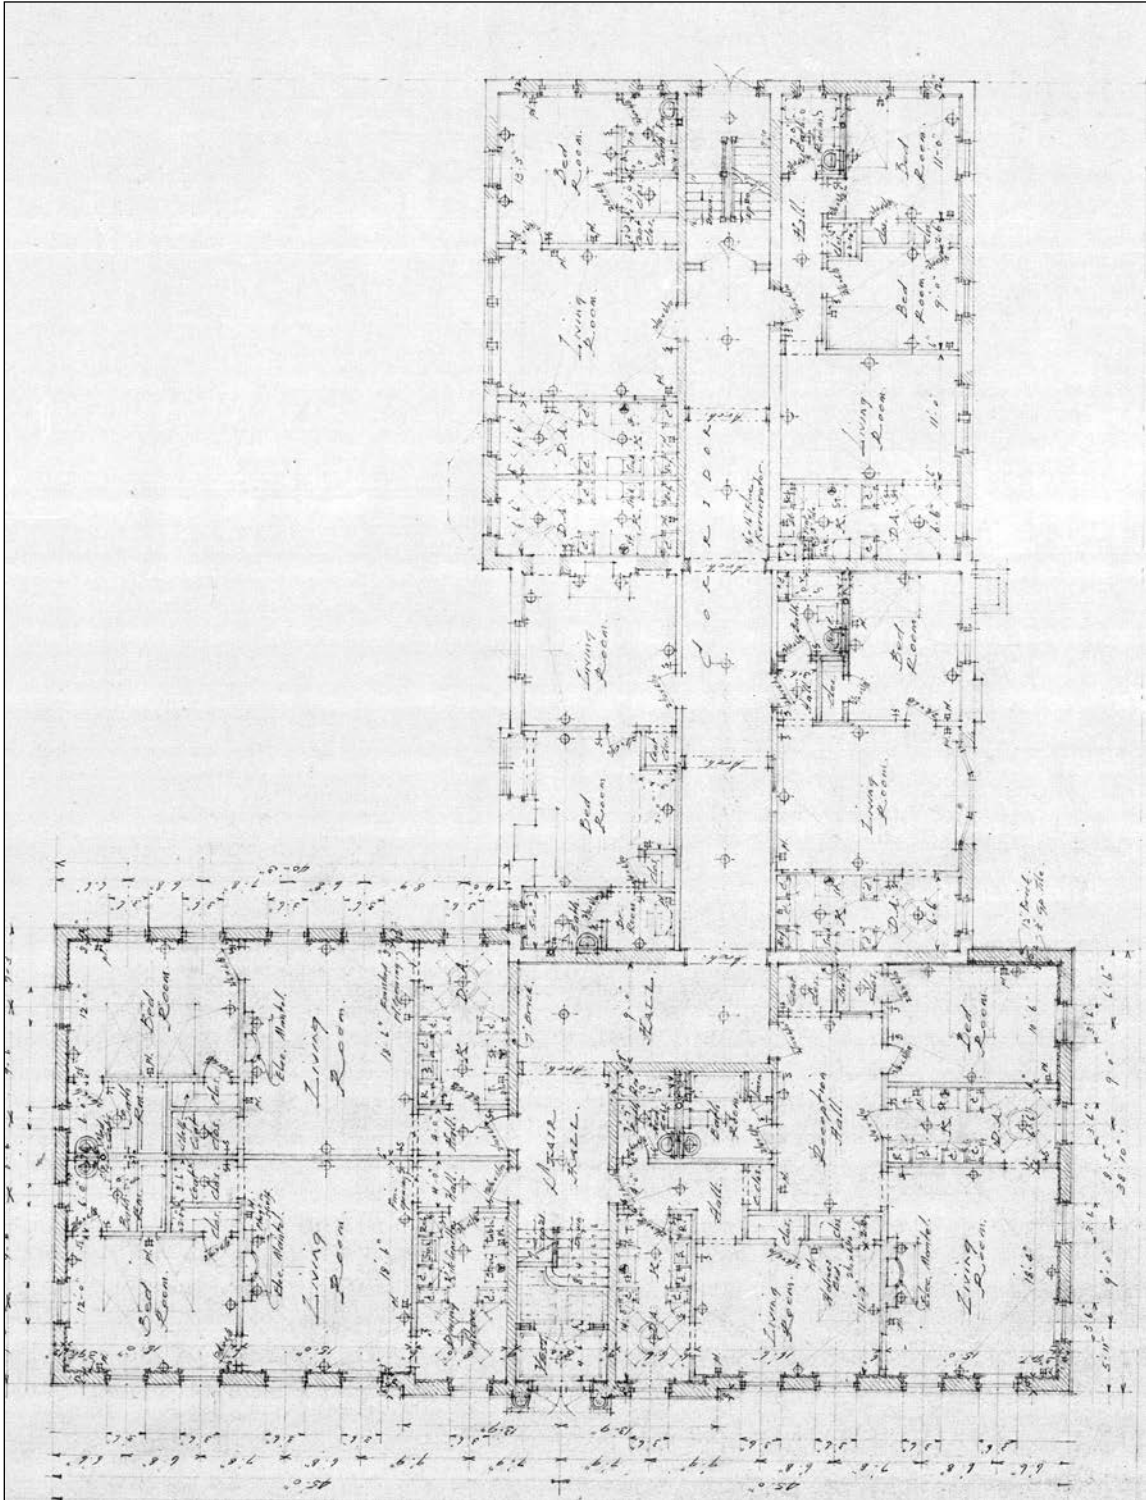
“First Floor Plans – Typical of Second and Third Floors,” architect’s plans, 1929.
